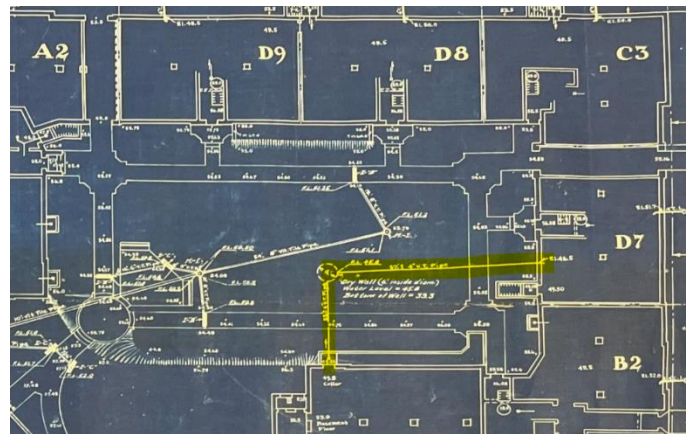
Record drawing with highlighted stormwater connections of the dry-well in northeast courtyard
